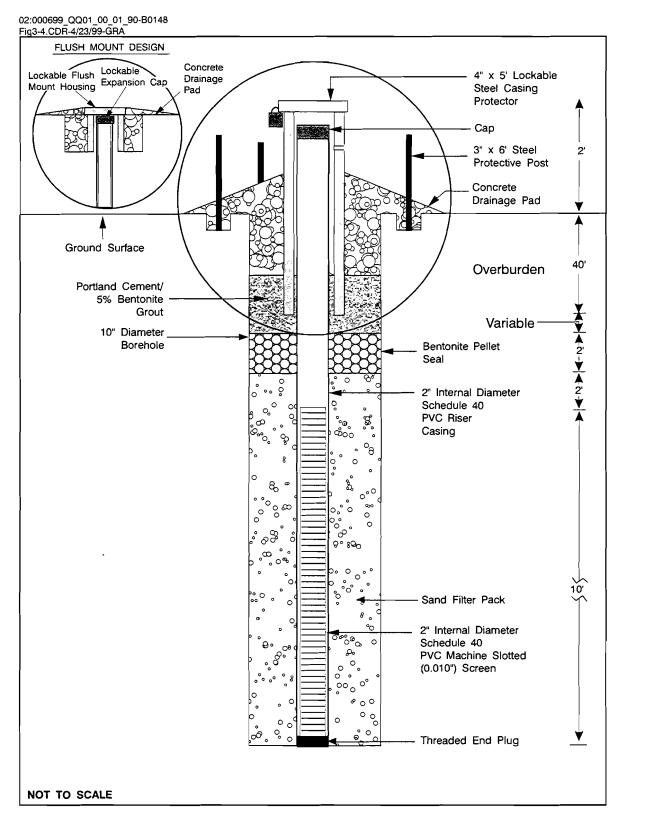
PROPOSED CONSTRUCTION FOR TELESCOPING OVERBURDEN GROUNDWATER MONITORING WELL
